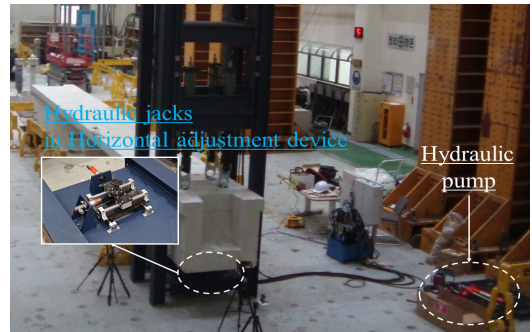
Hydraulic jacking system for horizontal position adjustment
